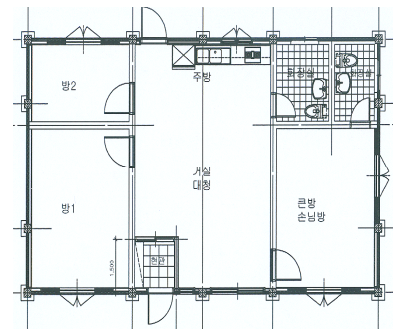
Floor Plan sample of Happy village Han-ok (H.V-4)
